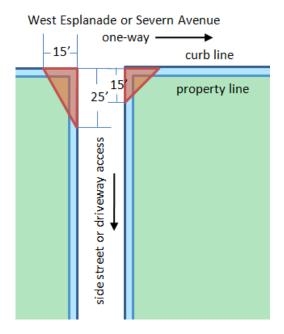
Clear Vision Area for Streets and Driveways Exiting West Esplanade or Severn Avenues
